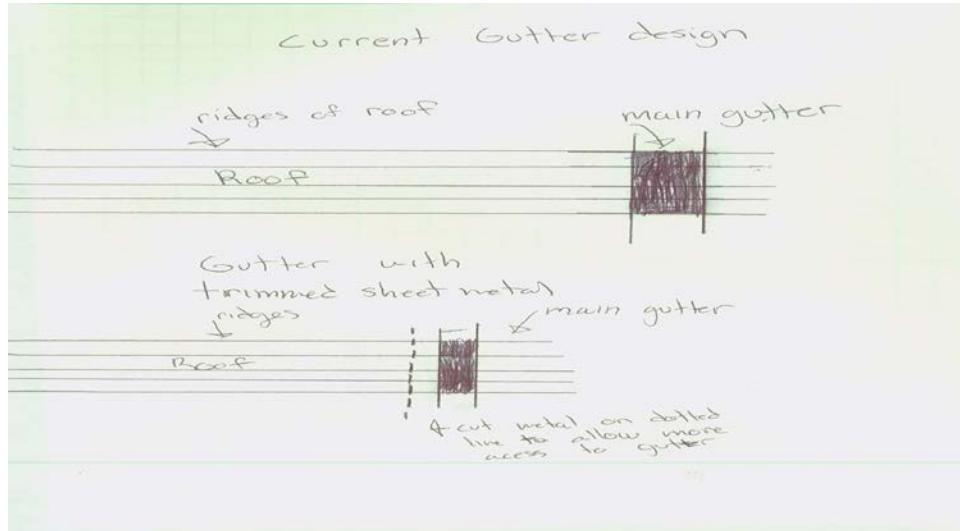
This figure shows the proposed cuts that will be made to open more access to the gutter for easier cleaning. Drawing by Jake Cooper.
